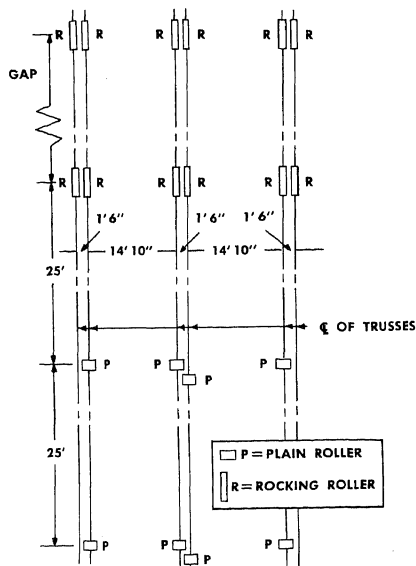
Typical roller layout showing plain rollers staggered under middle girder.
